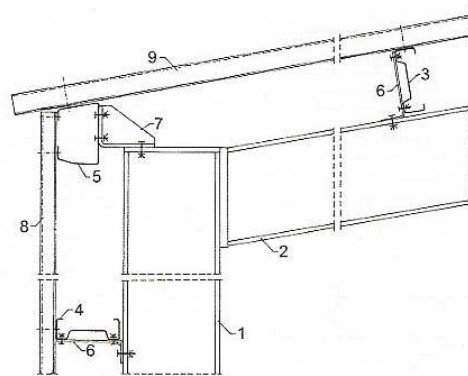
Connection between the roof and sidewall: 1- column, 2- roof rafter, 3- purlin, 4- wall girt, 5- eave girt, 6- cold-formed angle, 7- ribbed angle, 8,9- wall and roof corrugated sheets, respectively
